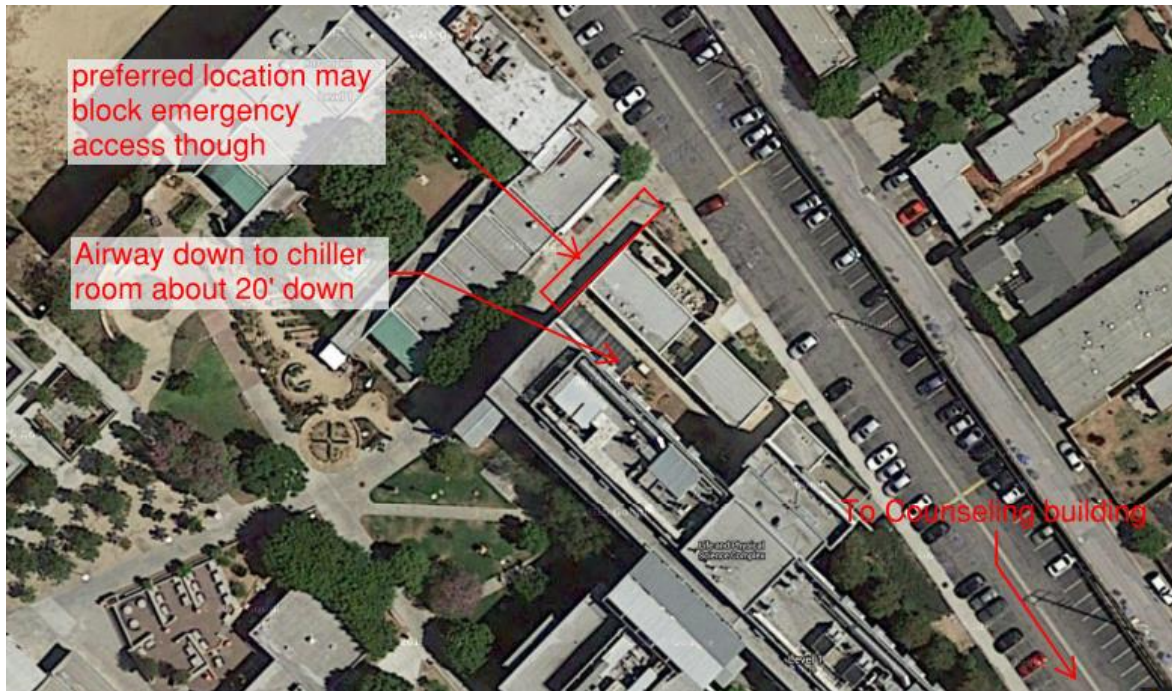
Alternative 1 Temporary Equipment Layout Options
